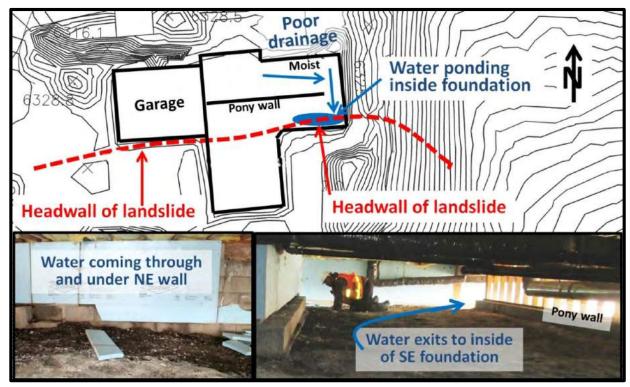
Foundation of the home at 1045 Budge Drive plotted on a one-foot contour map showing where water flows around the pony wall to pond behind the southeast foundation. Picture lower left is looking north where moisture regularly comes through or under the concrete block foundation. Picture lower right is looking east.
